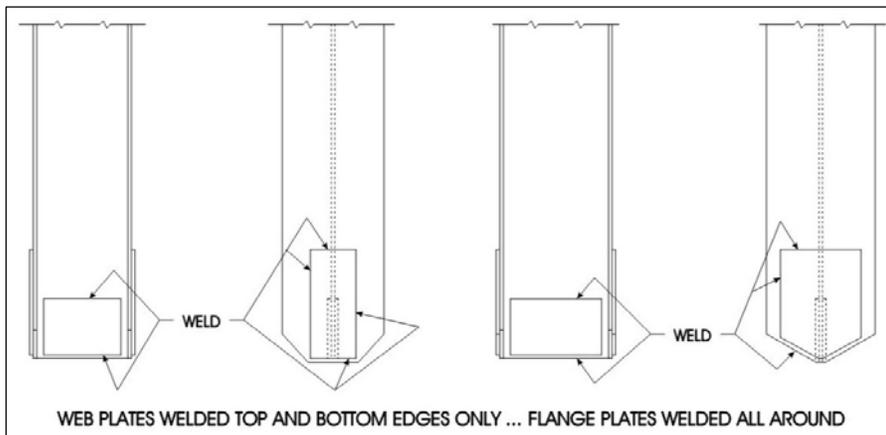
34: Types of Pile Point Reinforcement for H-Piles
